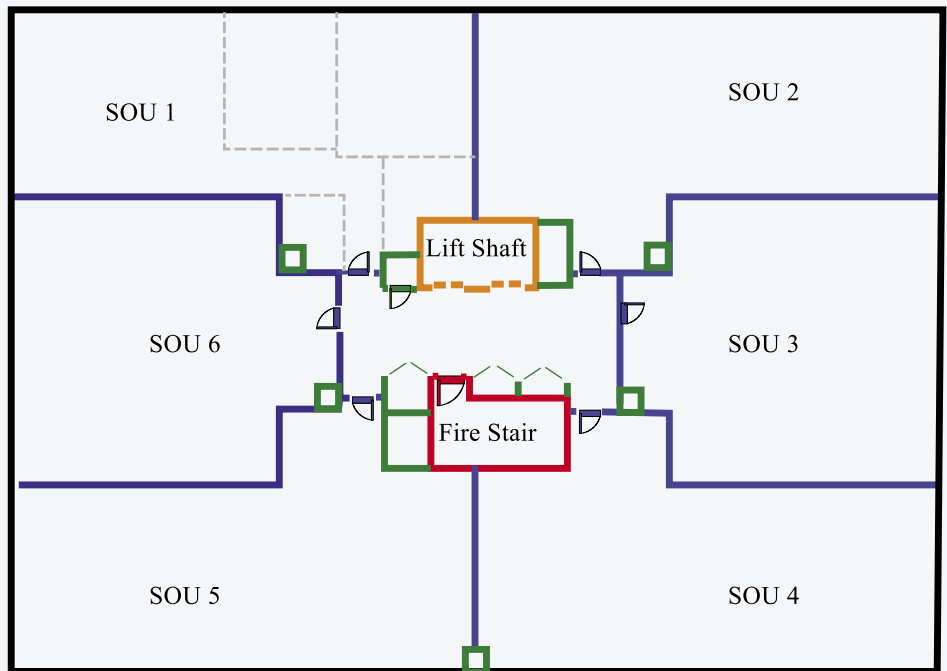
Schematic plan of a residential level of a generic Class 2/3 building.
